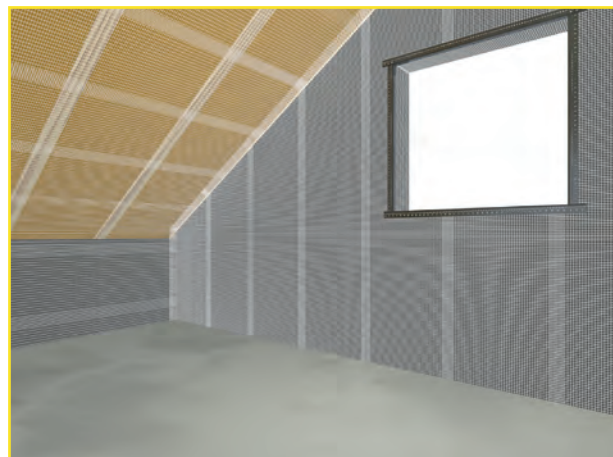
Overlapping of gable wall to roof slope. In this case, the grounding of the gable surface is done via the ceiling surface Fig. 16a
